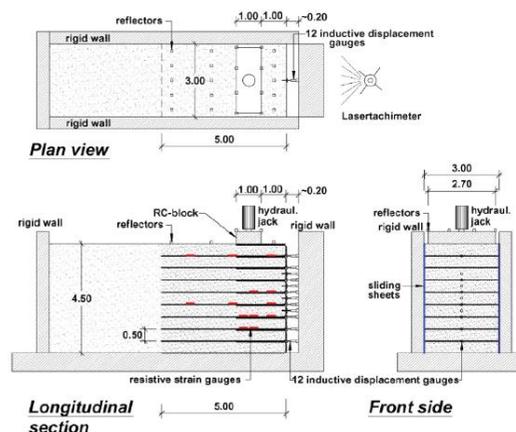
Test set-up and instrumentation of a full scale geogrid reinforced bridge abutment loading test (Alexiev 2007)
